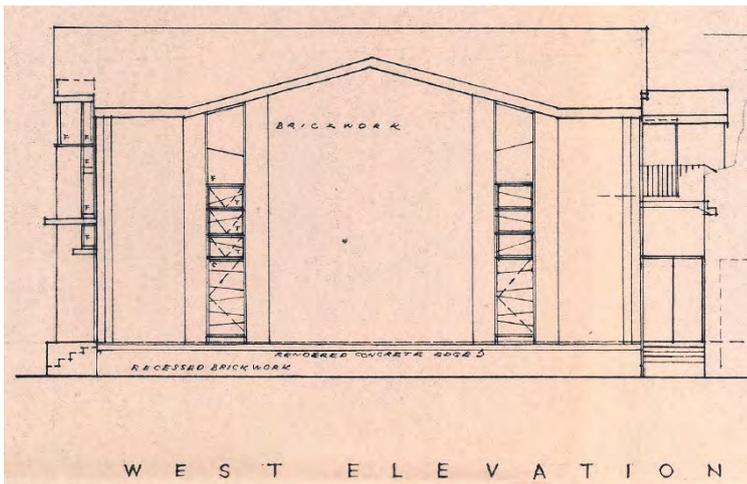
Drawing dated July 1961 (Dr. Ernest Fooks), showing west elevation. (Source: Council Building File)
